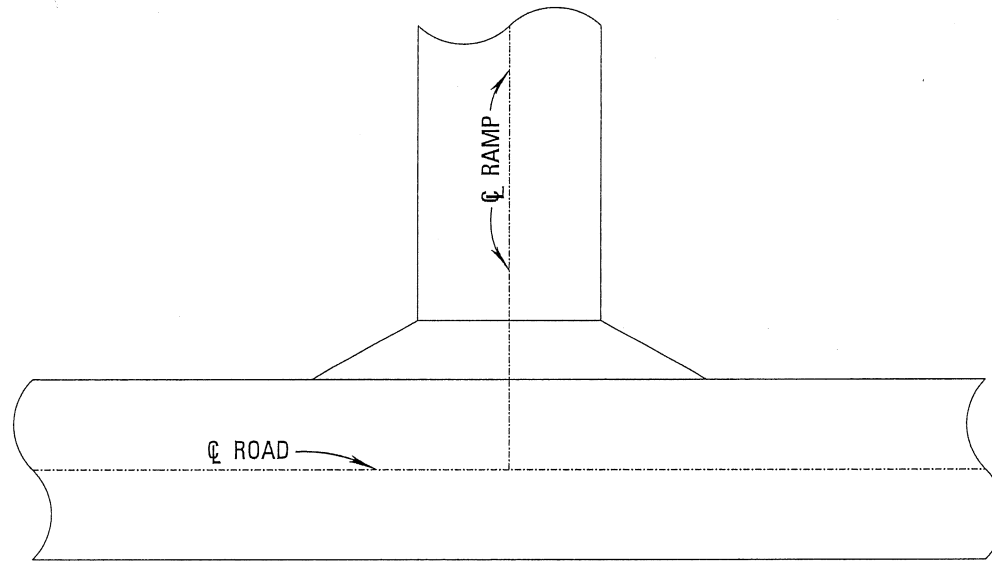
DETAILS OF BITUMINOUS CURB SPILL THOUGH
